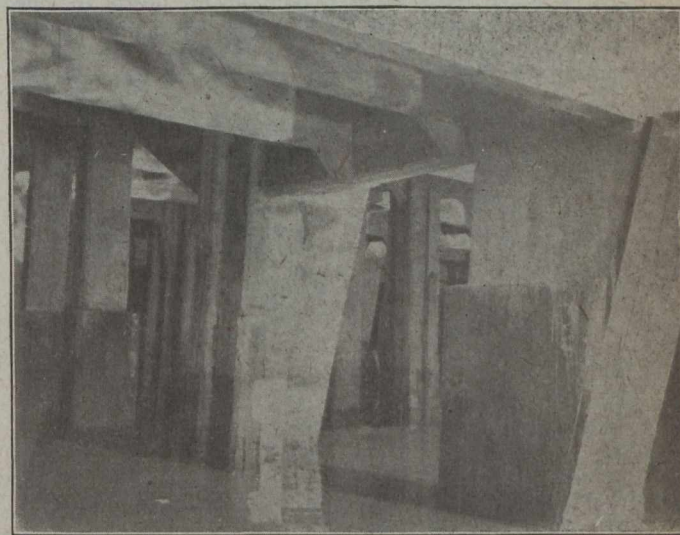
Pier No. 2—View Under Pier Deck, Frost Protection Not Completed
